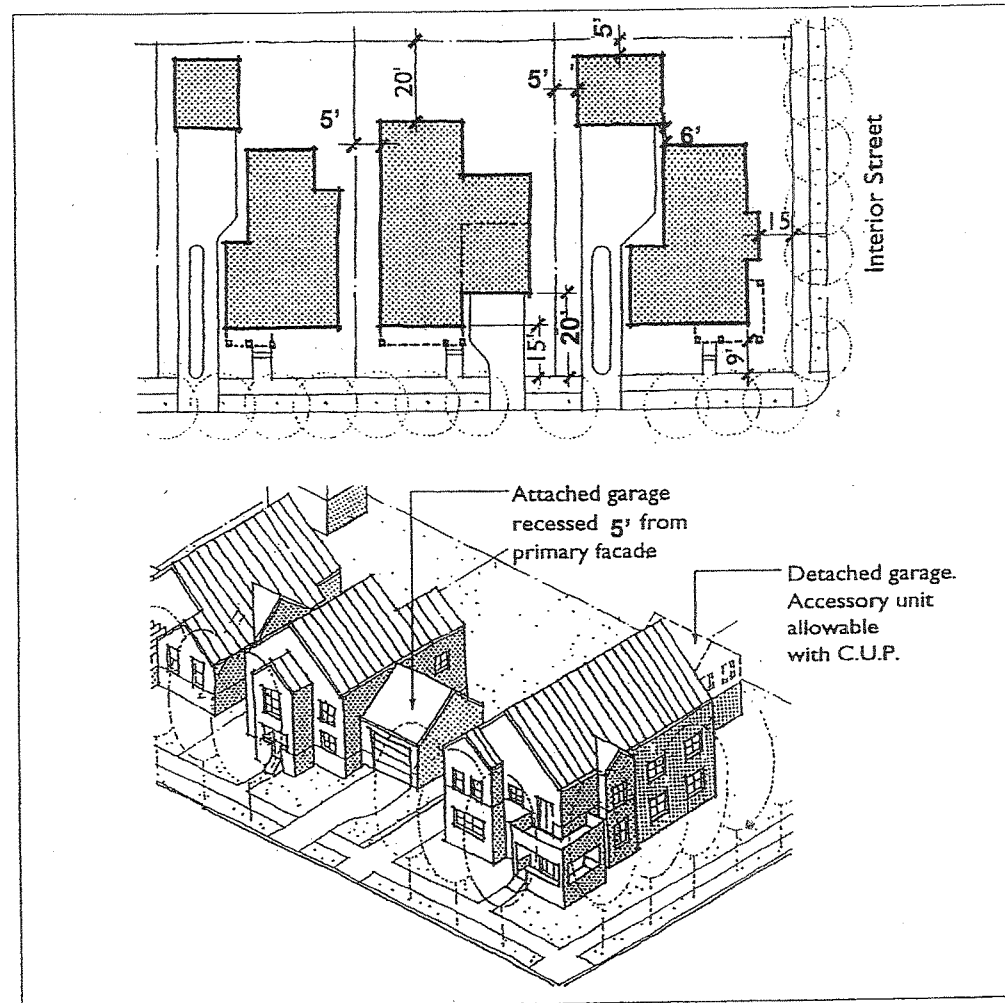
, Residential Building Setbacks. This figure graphically depicts the minimum setback requirements set forth in Table 5. Note that the garage can be situated in two basic positions: attached to the house but setback at least 5 feet from the front facade or detached and near the rear of the lot.
